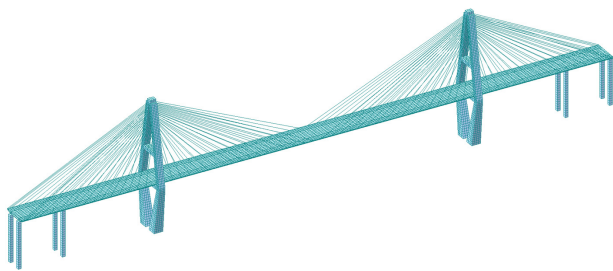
shows a long-span bridge with a simple support, where the bridge span is arranged as a single span of 200 m, with the total bridge length of 800 m; the center distance of the main cable of 6 m, the width of the traffic lane is 4.5 m, and the width of the long-span bridge is 35 m; the cable tower has an inverse-Y structure made of solid reinforced concrete. For convenience of modeling, the height of both the left and right cable towers is 30 m. A geometric model of the long-span bridge was established according to the dimensions and layout, as shown in Fig. 2.
